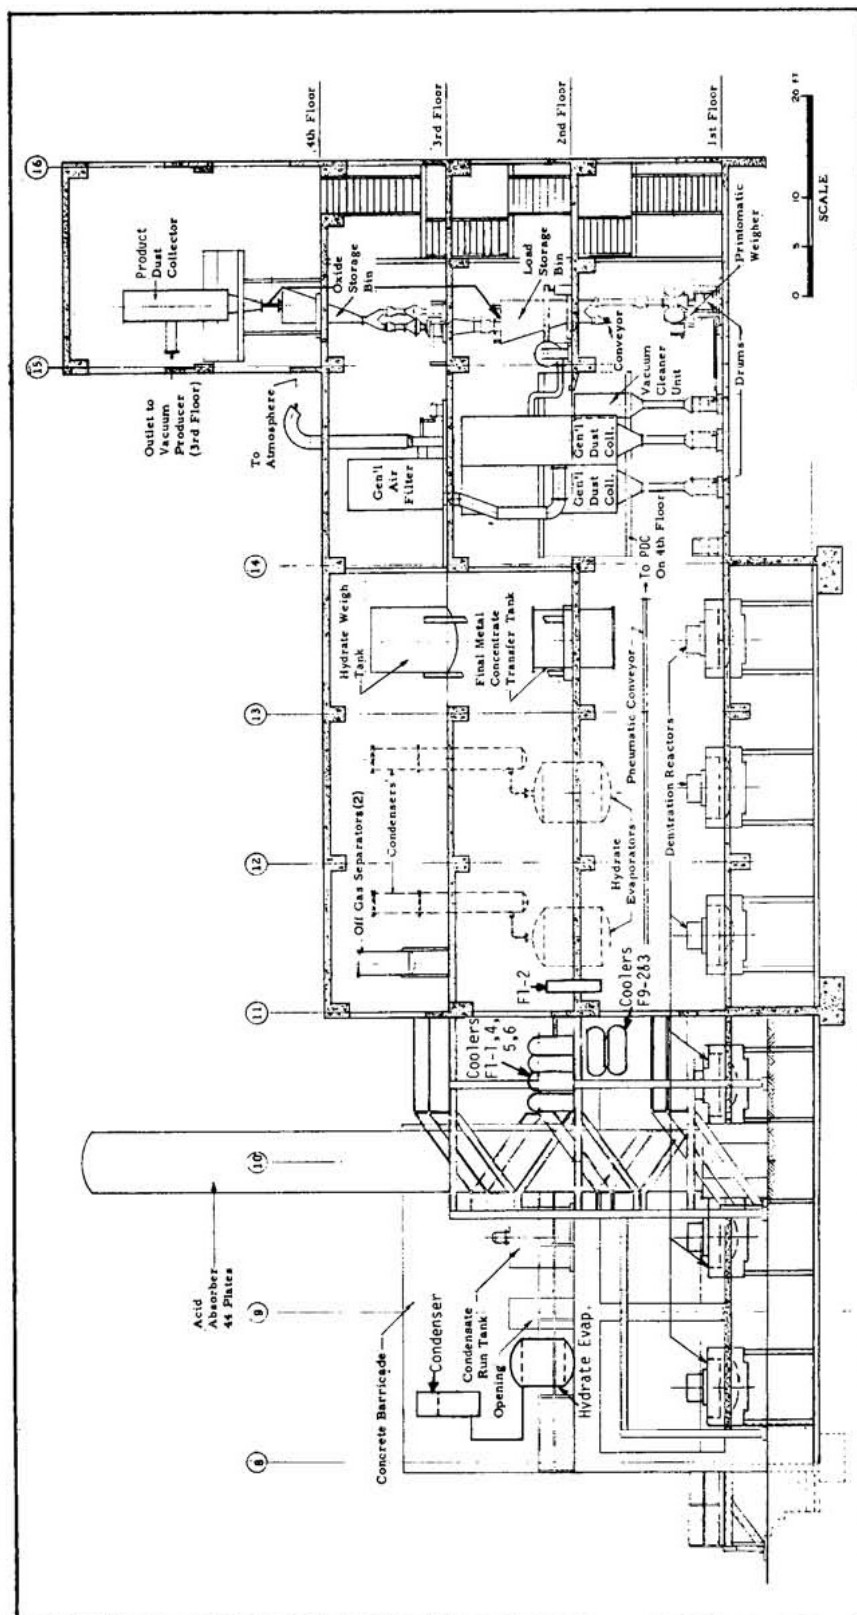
Vertical sectional elevation view of the A-Line facility [McKibben 1976]
